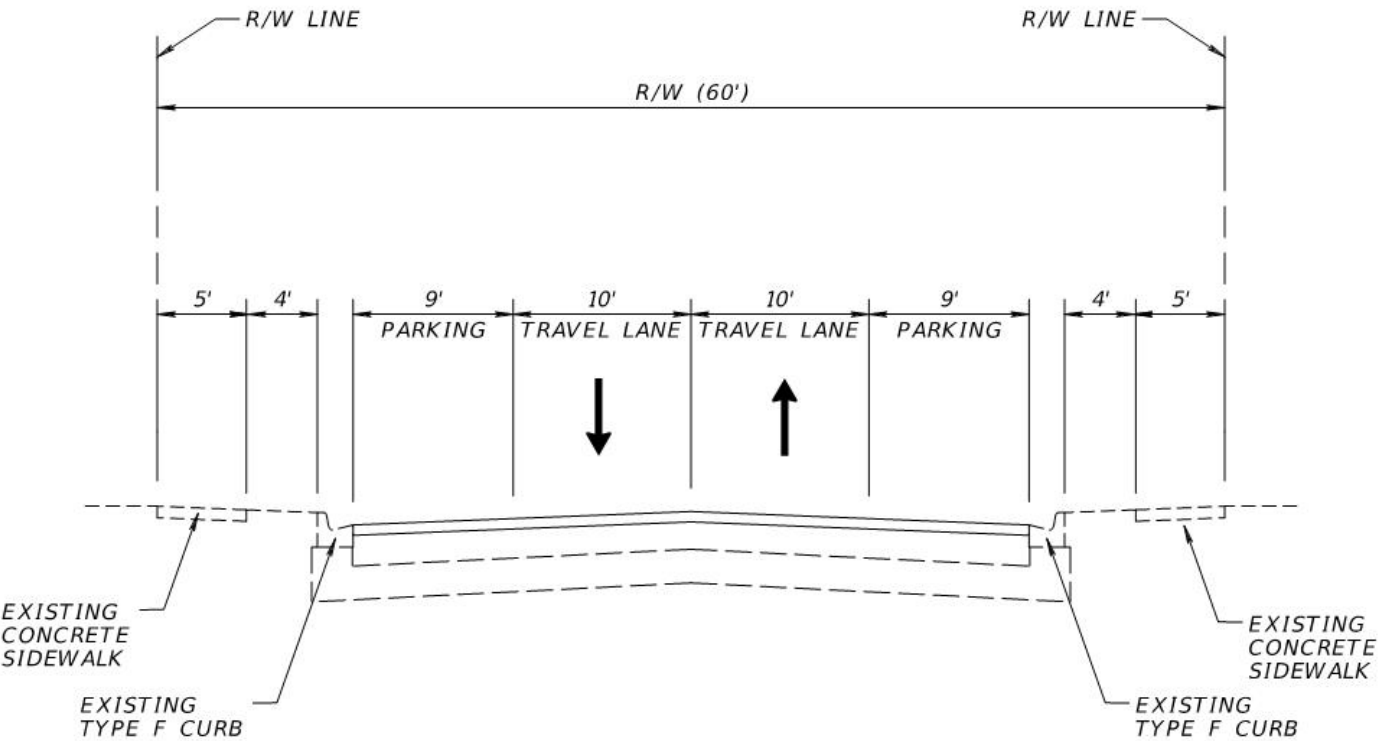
Typical section of MLK Drive (North of Cervantes Street)
